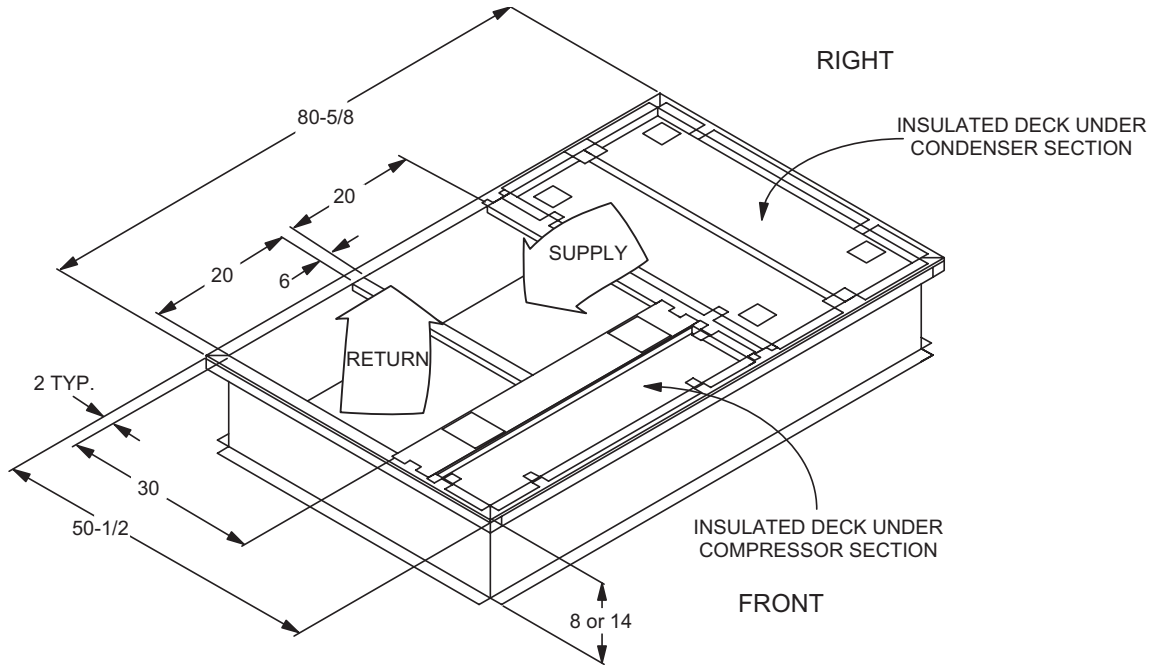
PREDATOR® ROOF CURB DIMENSIONS
